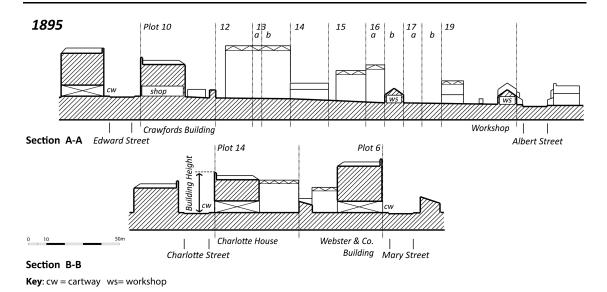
Street-to-street cross-sections, 1895 (cf. Figure 3).
